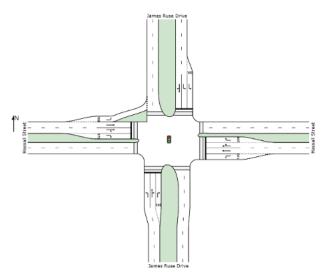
Grade separation of James Ruse Drive/Hassall Street intersection layout – GS5
